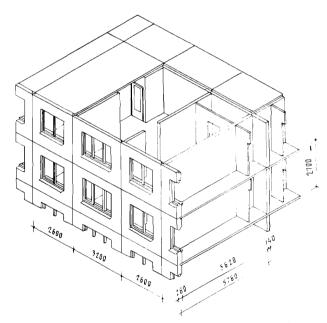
Frameless building with load-bearing cross walls, spaced at about 3 m, floors supported along edge.
